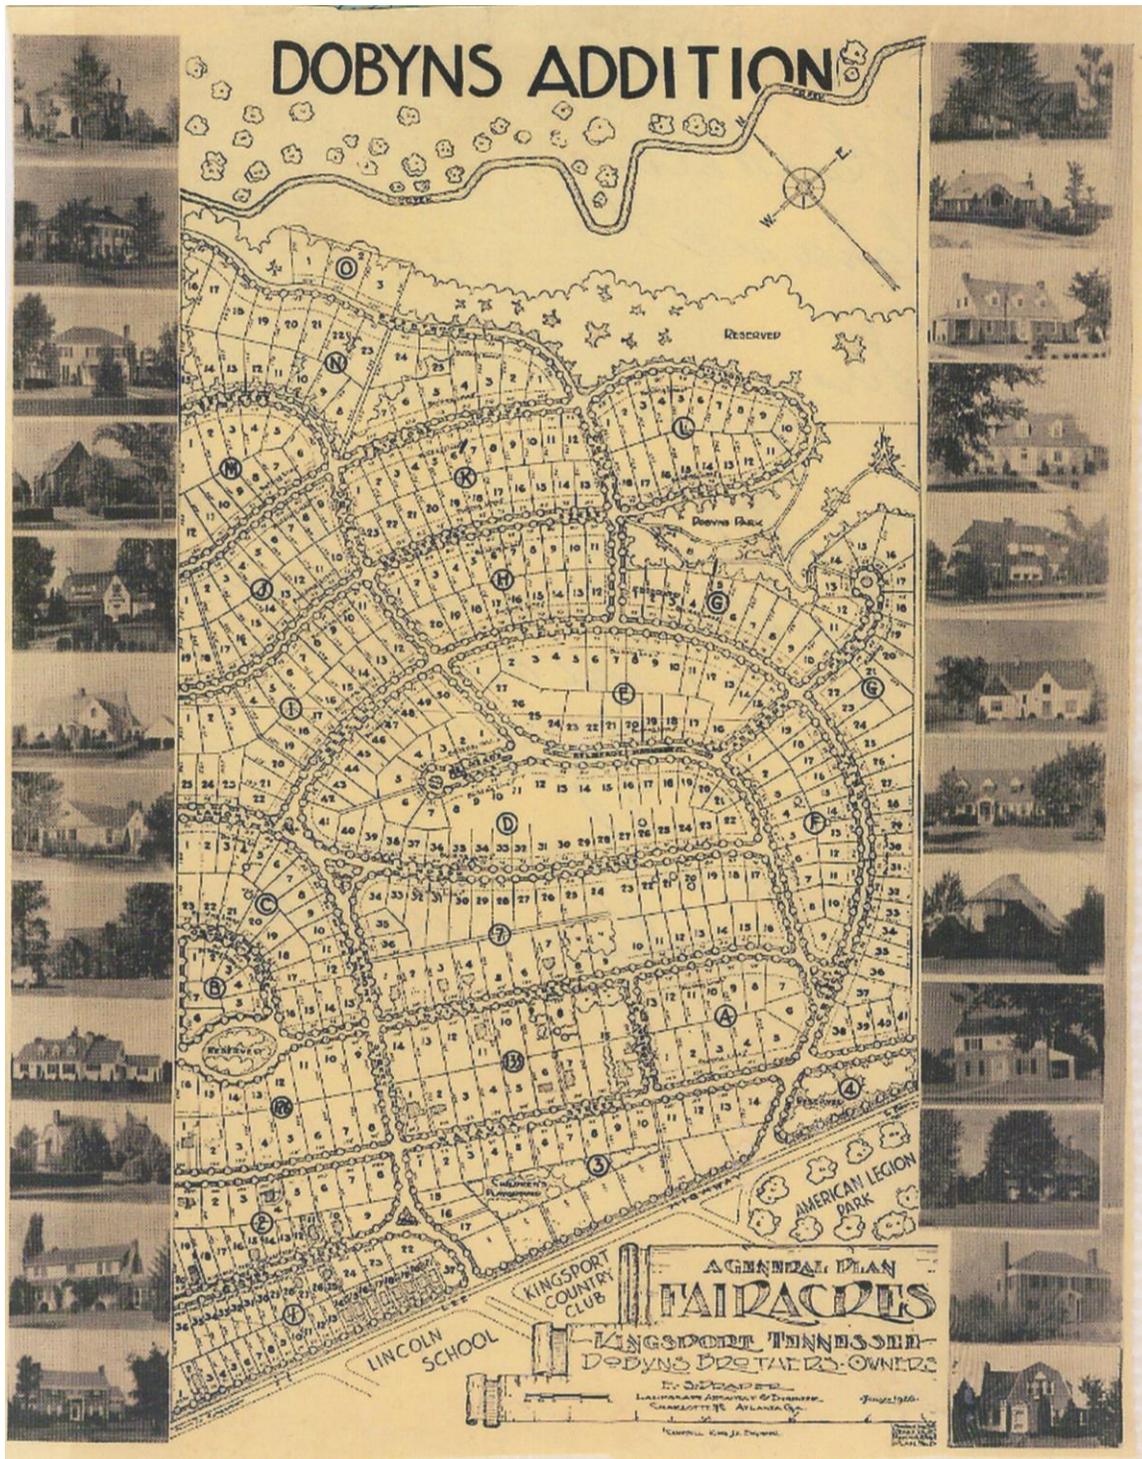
Photograph of the Fairacres Subdivision Plan dated July, 1926.
